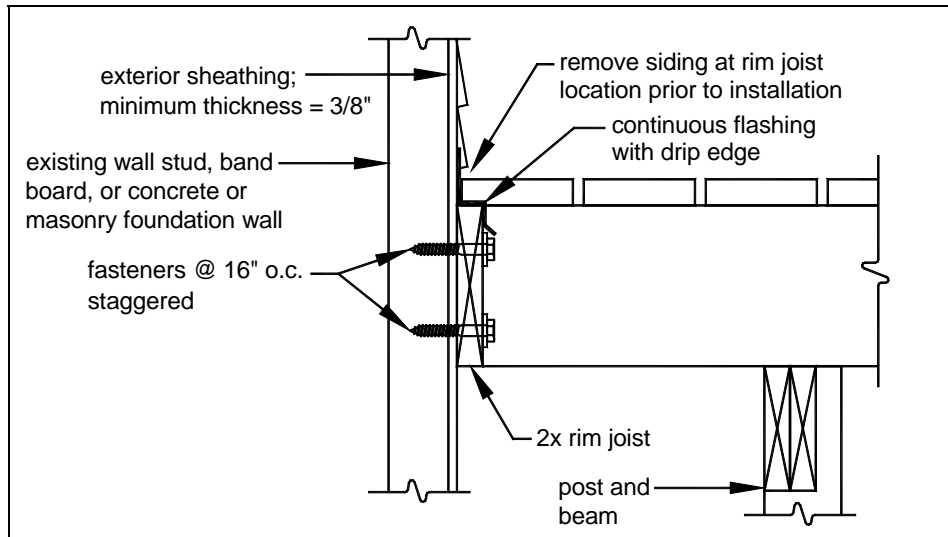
ATTACHMENT TO HOUSE LATERAL SUPPORT
